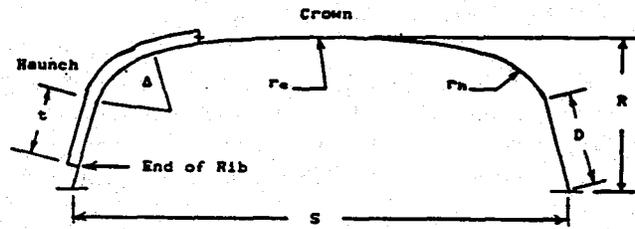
A Standard Terminology of Structural Plate Box Culvert Shapes
